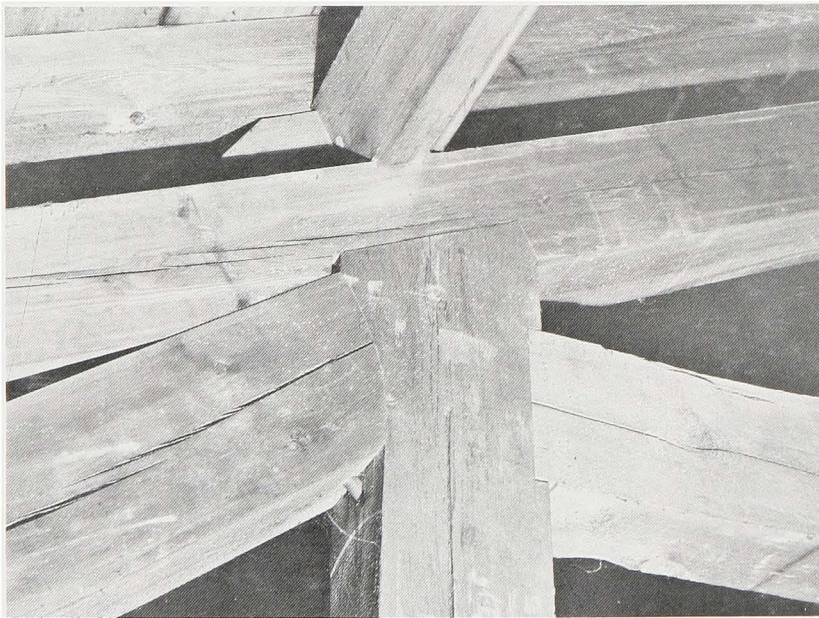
Close-up view of wood joints in the truss system of the Clock Tower Building.
